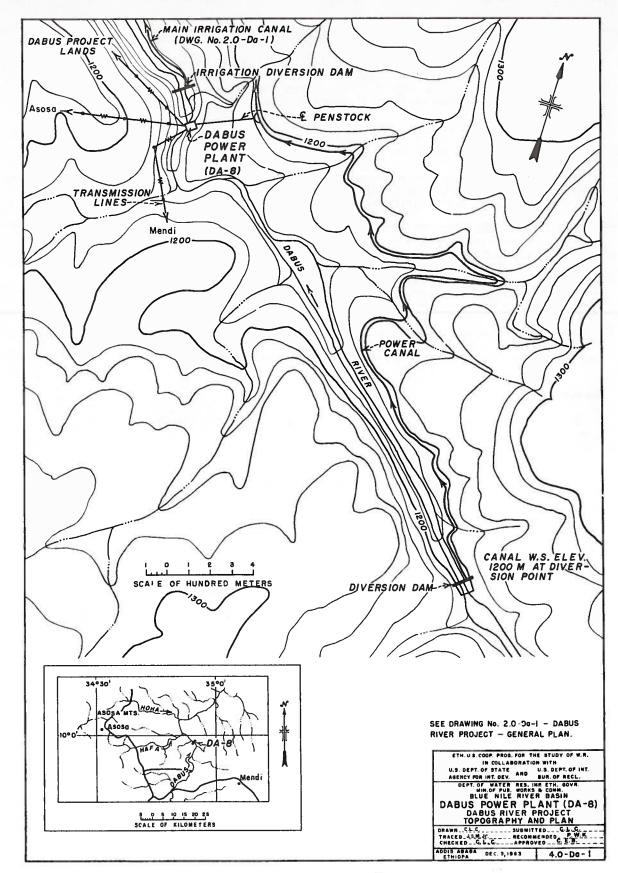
Dabus Power Plant (DA-8)--Topography and Plan
